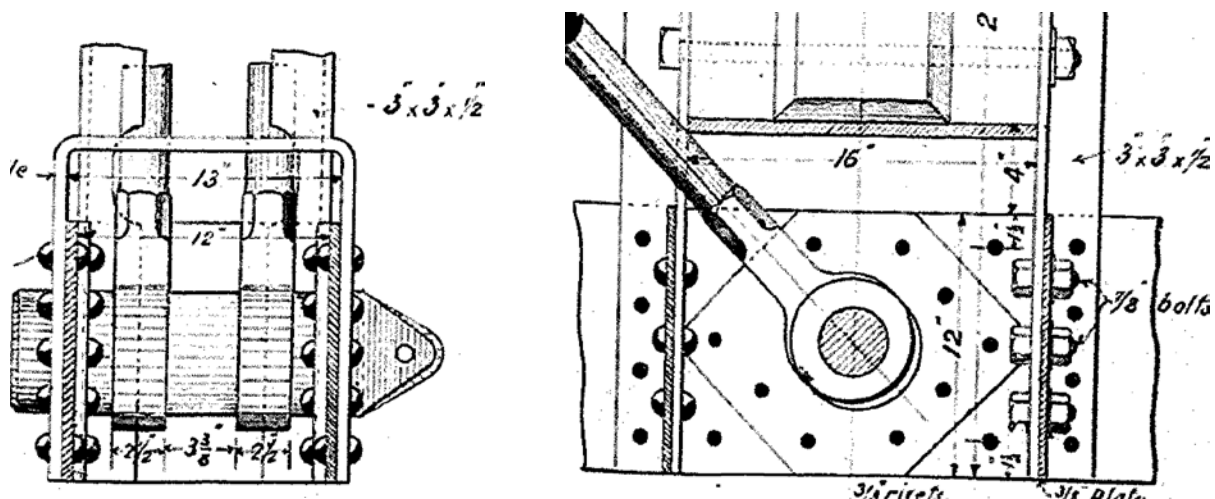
Original Drawings showing details for Bottom Chord Pins in 70' de Burgh Truss at Fennell Bay
